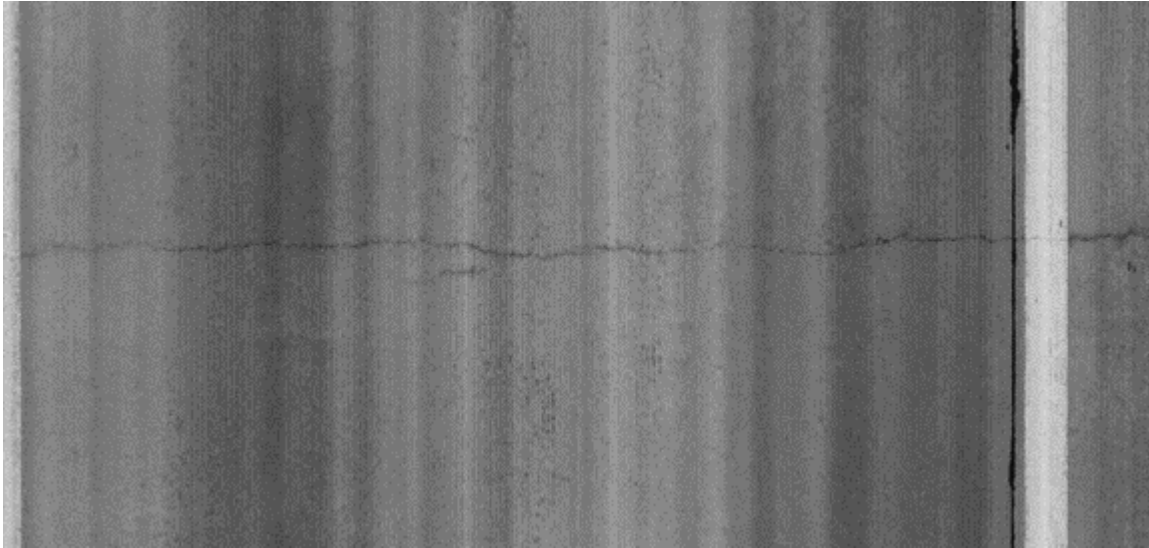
Low-severity transverse cracks on CRC pavements [IL 390 westbound, approx. MP 13.327].
